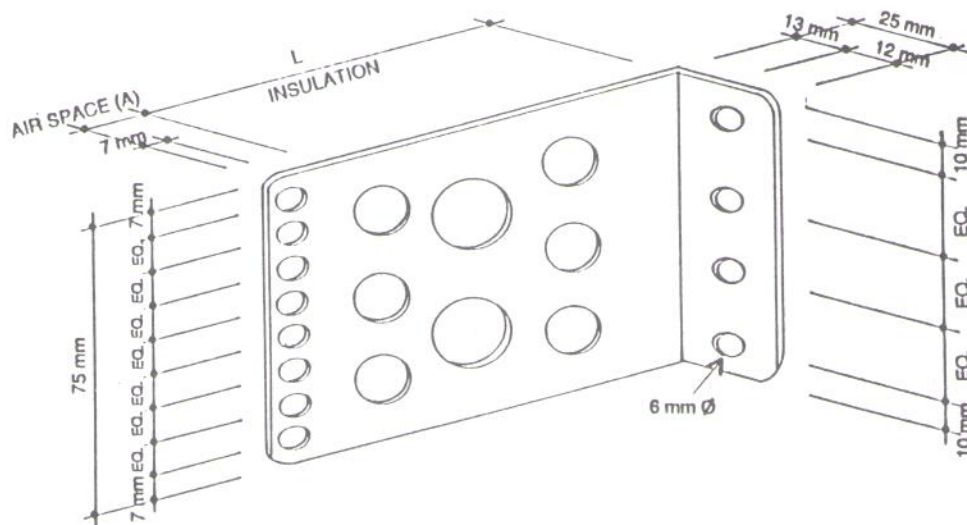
Dimensions of Shear Connector Plate used to attach to the Flange of the Steel Stud
